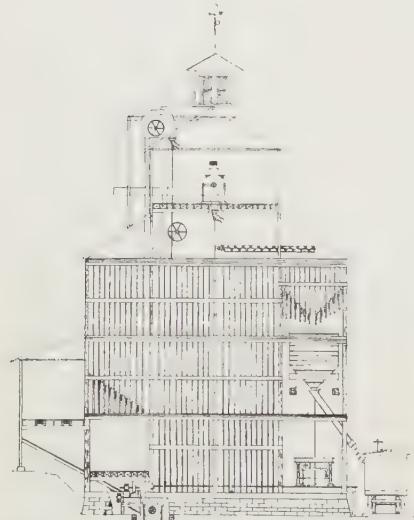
End Elevation Crocker's Elevator at Maroa, Ill.
